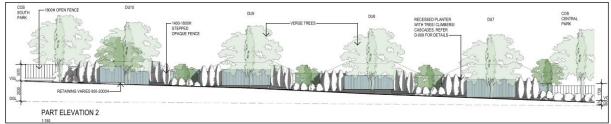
Streetscape presentation to Swansea Road – Part 2 elevation
